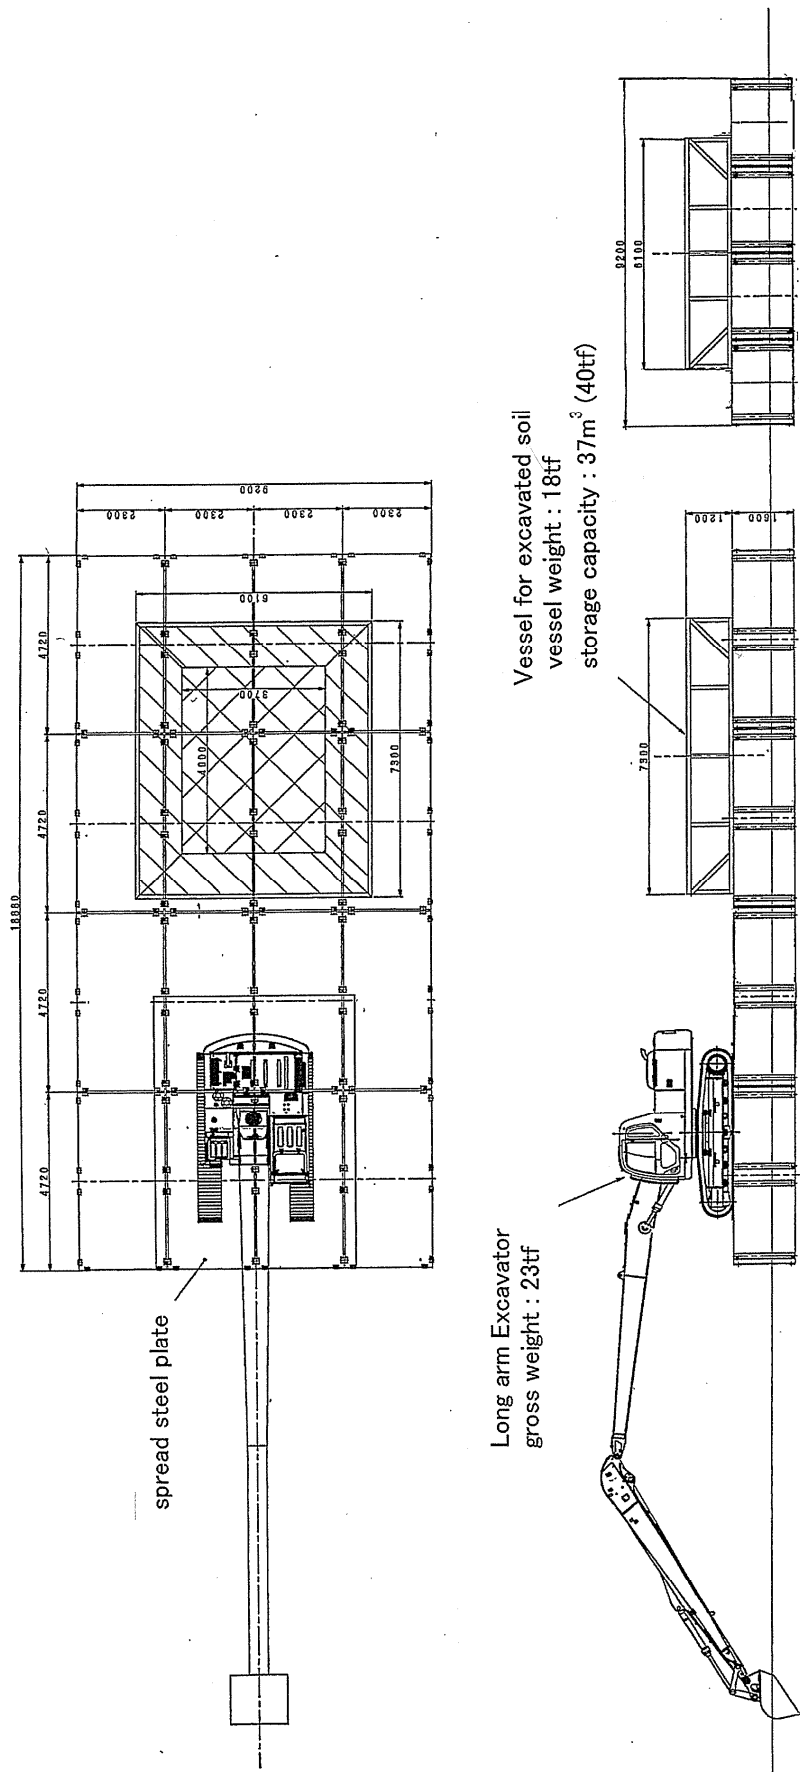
General View of Pontoon loaded with Excavator and Vessel
